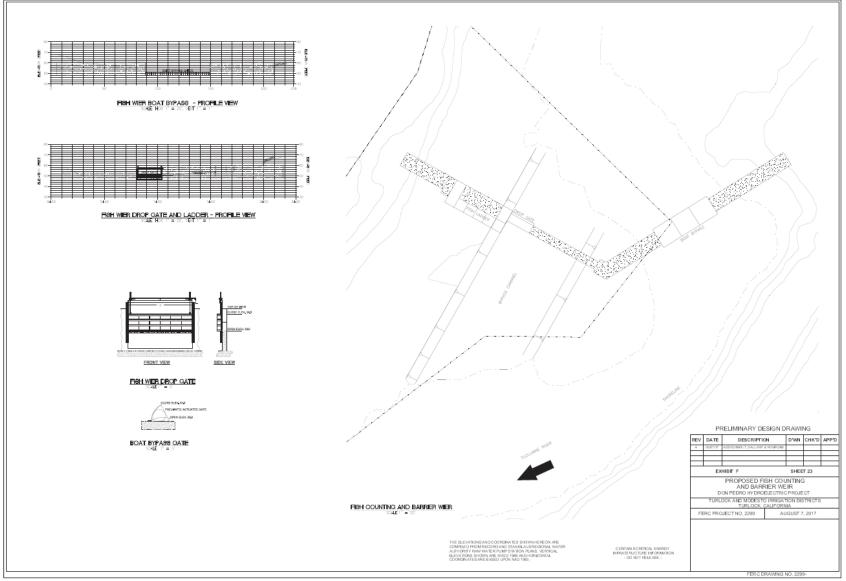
Plan view for proposed fish counting and barrier weir and take-out/put-in (boat bypass).
